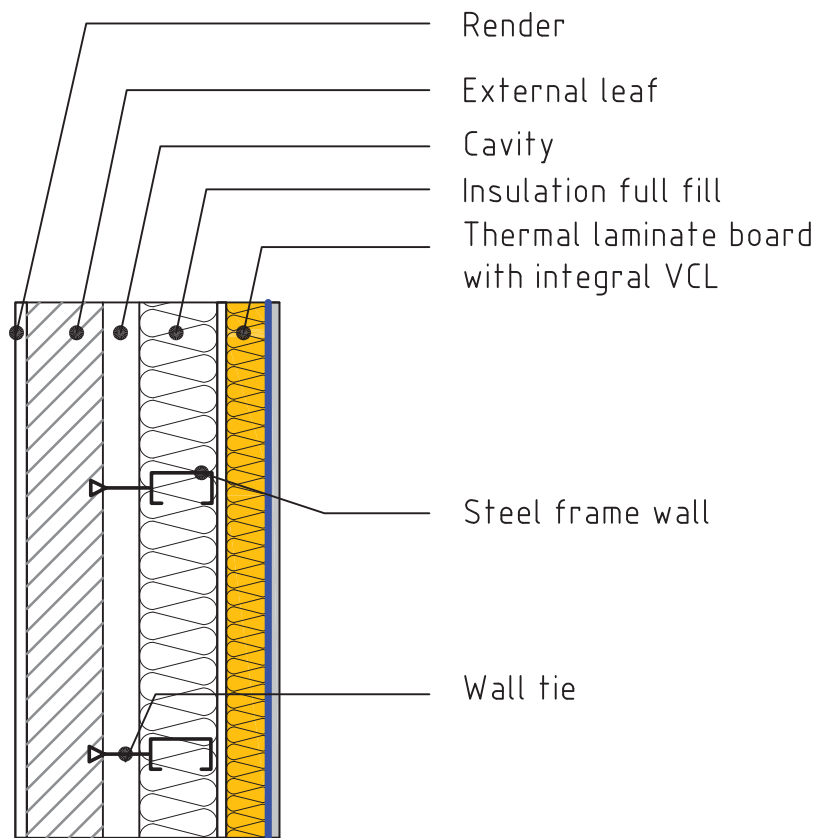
Steel frame with thermal laminate added and existing board in place (plan view)
